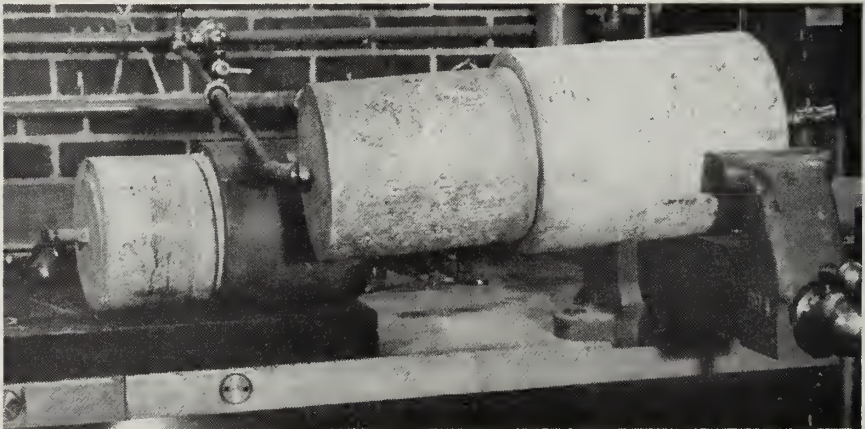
Equipment for leak test, showing joint 6 (Fig. 1) being tested with air at 200 psi. Joint 4 is in background ready to be tested
